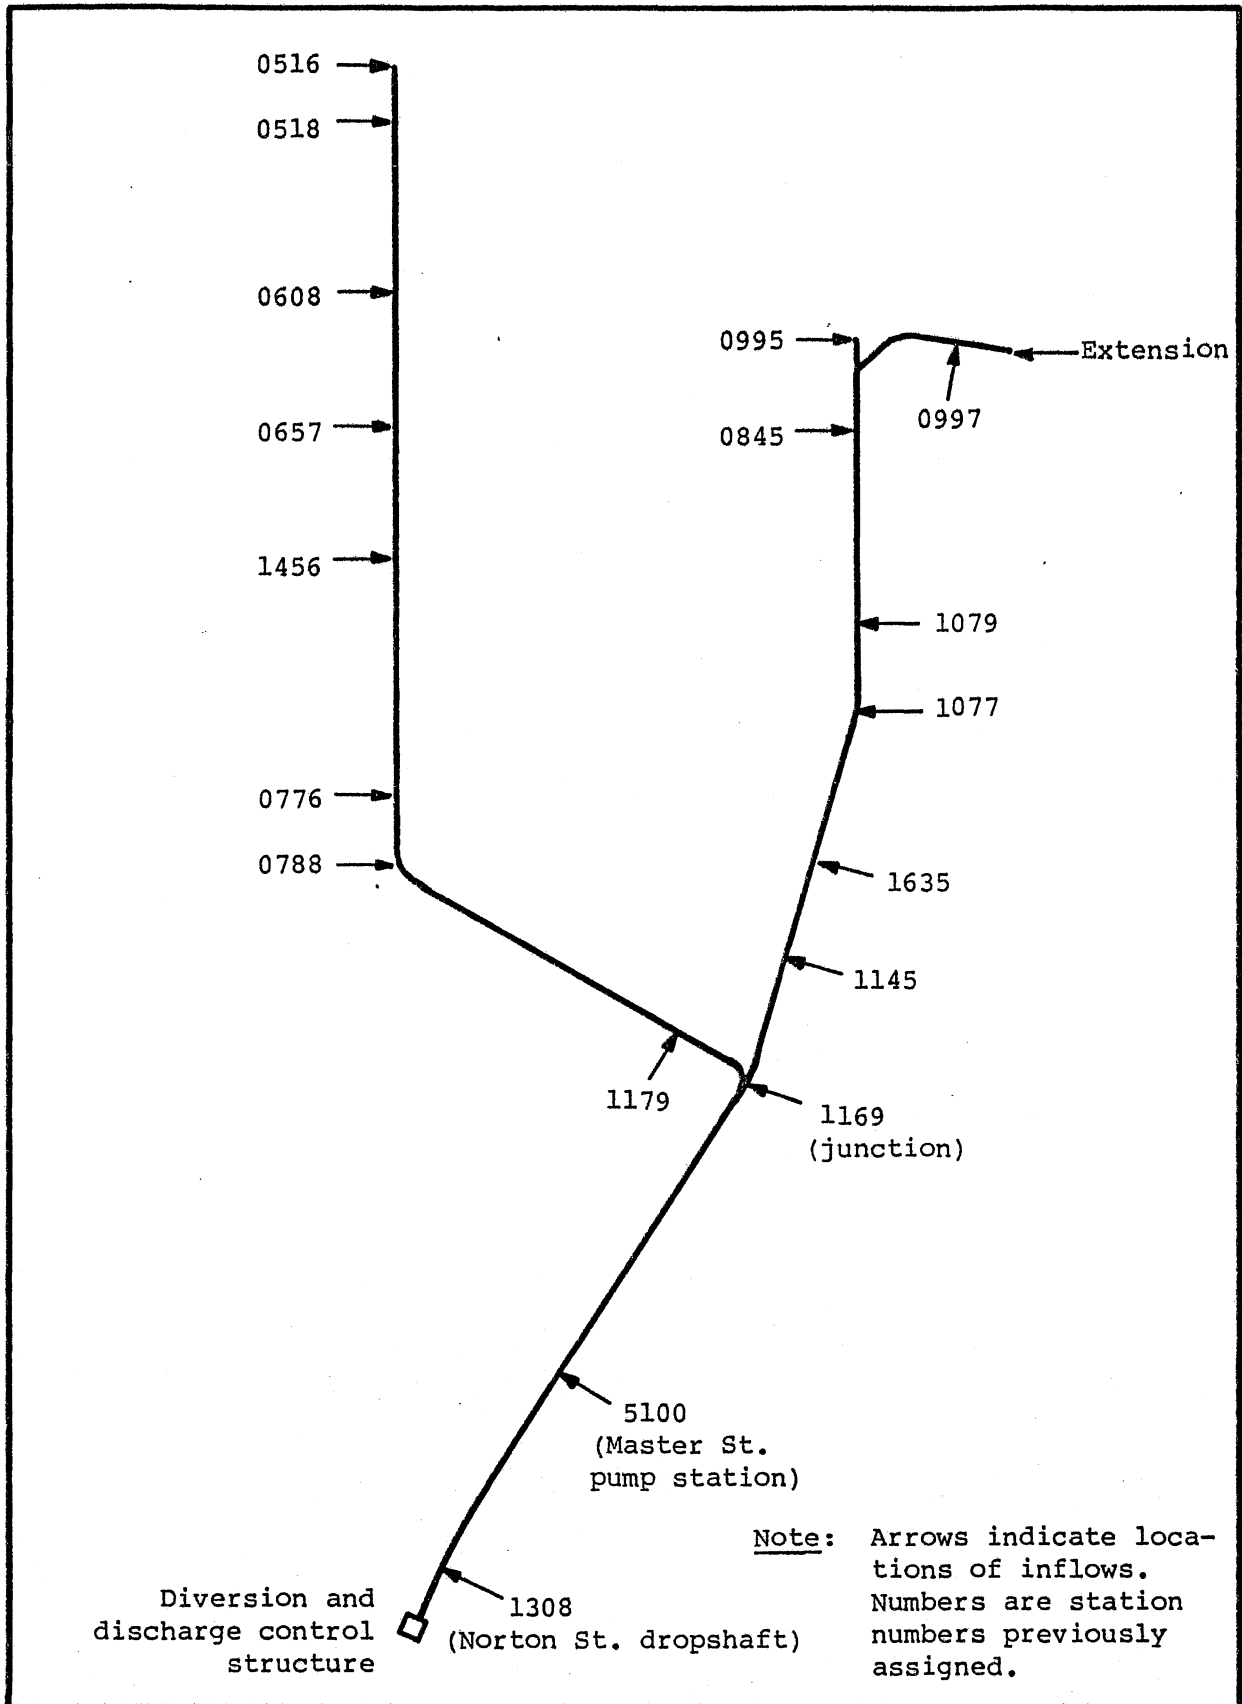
General Layout of the Culver-Goodman Tunnel.
